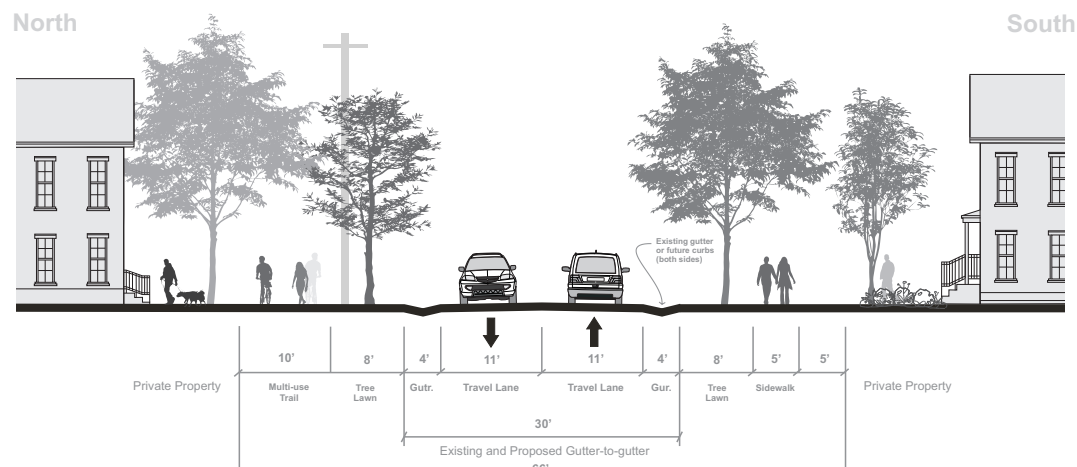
West Main Residential District Alternative 2 Cross Section
